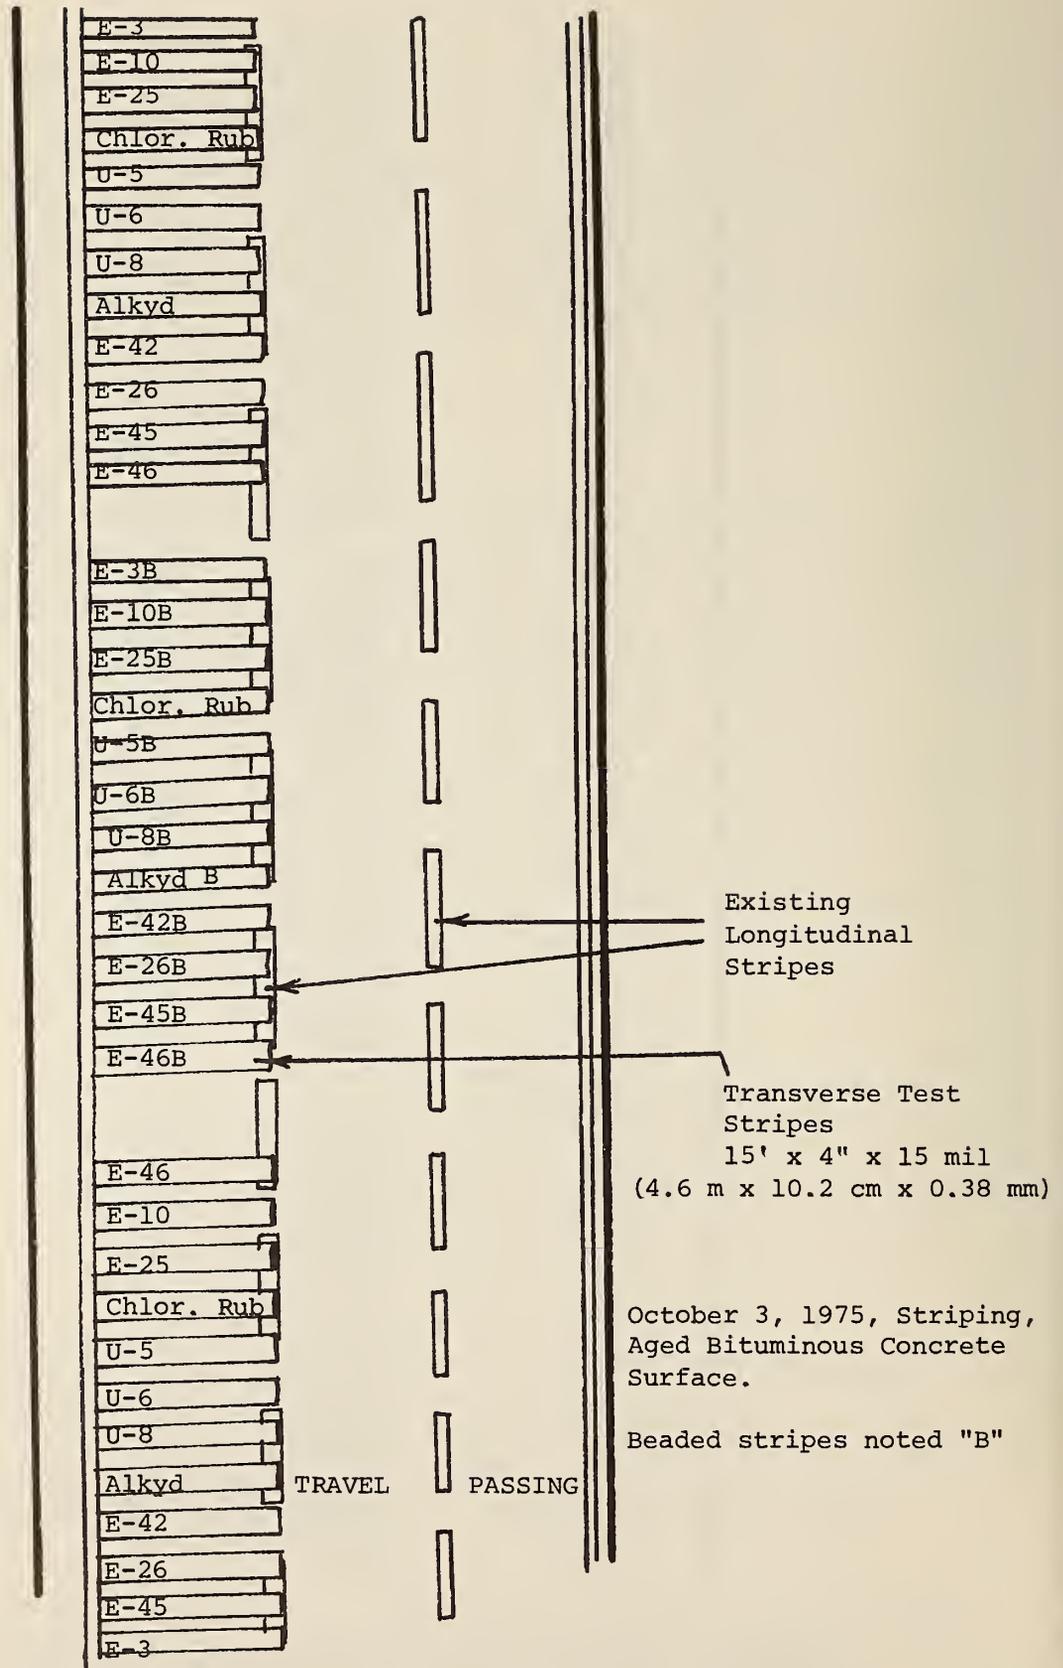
ROUTE 128 LYNNFIELD STRIPING LAYOUT
